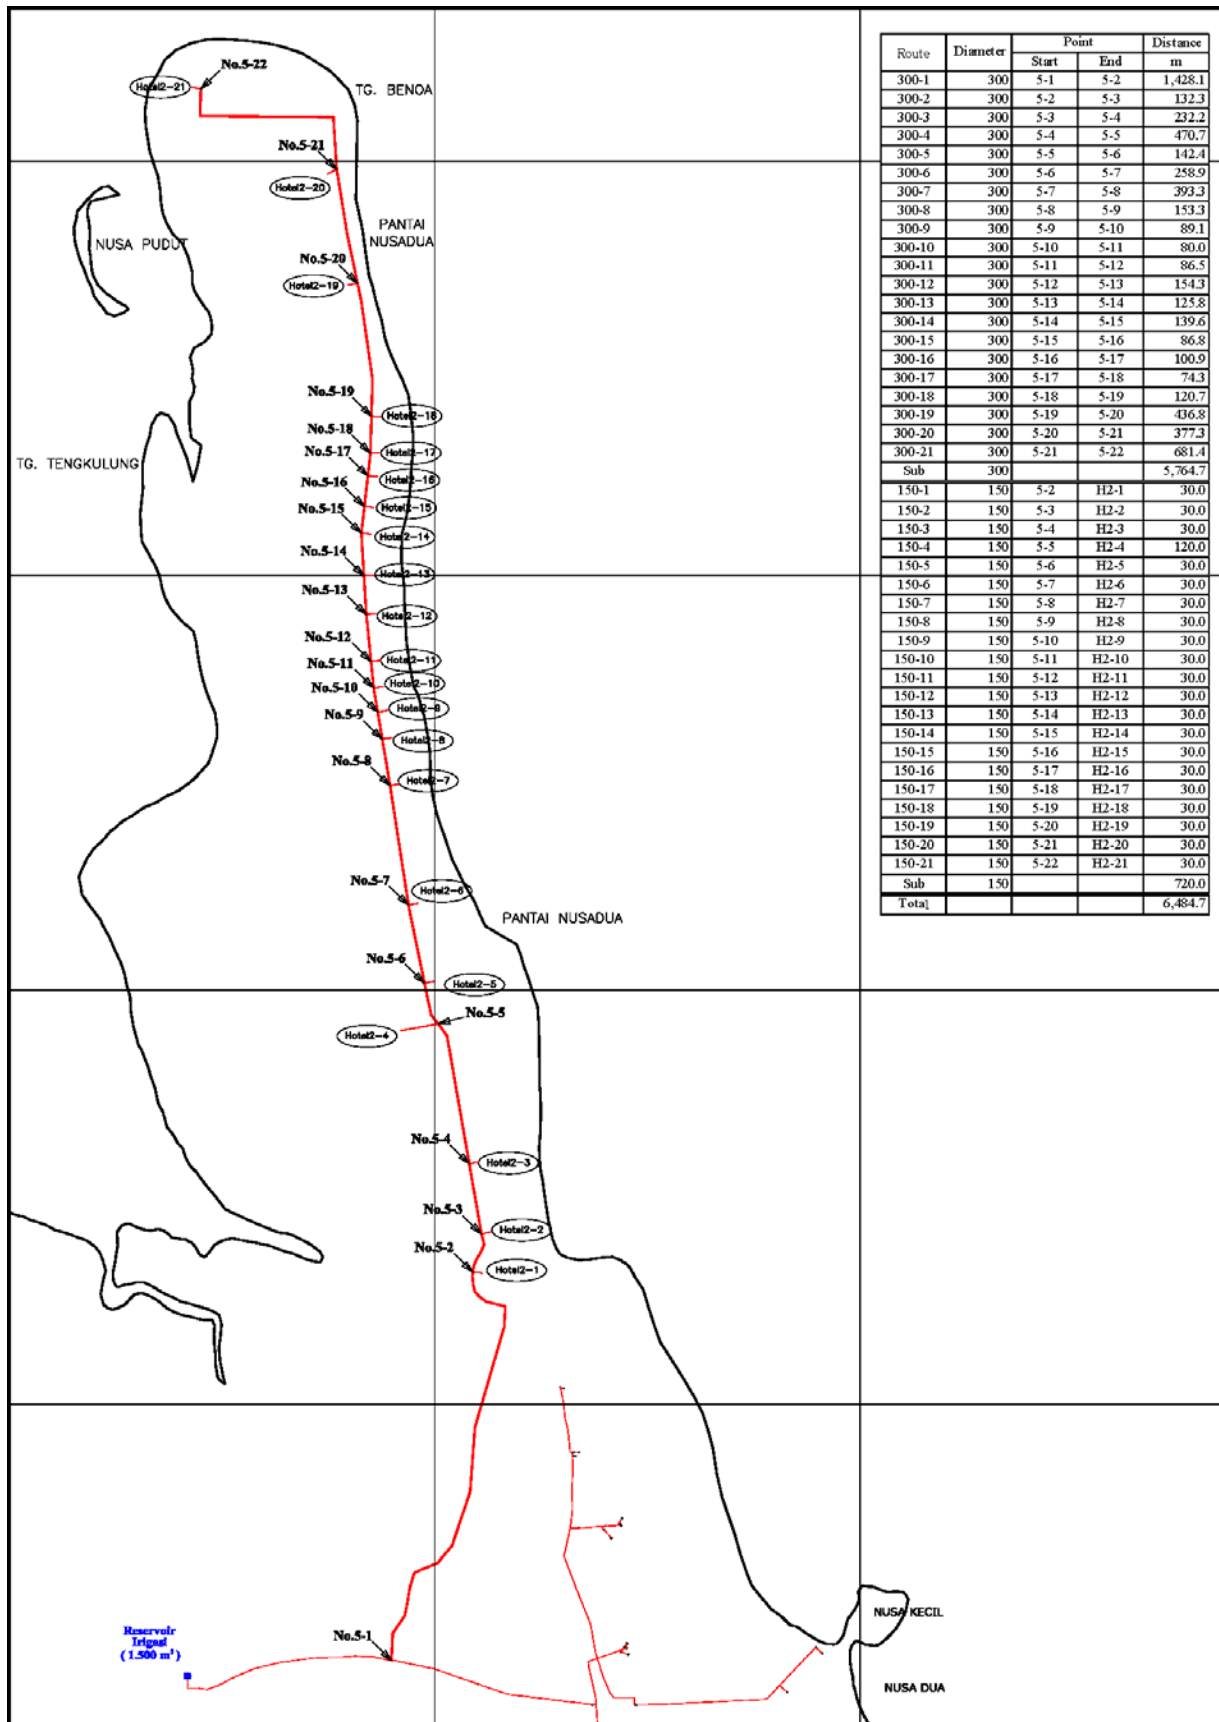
Plan of Distribution Pipe in Bena Area
